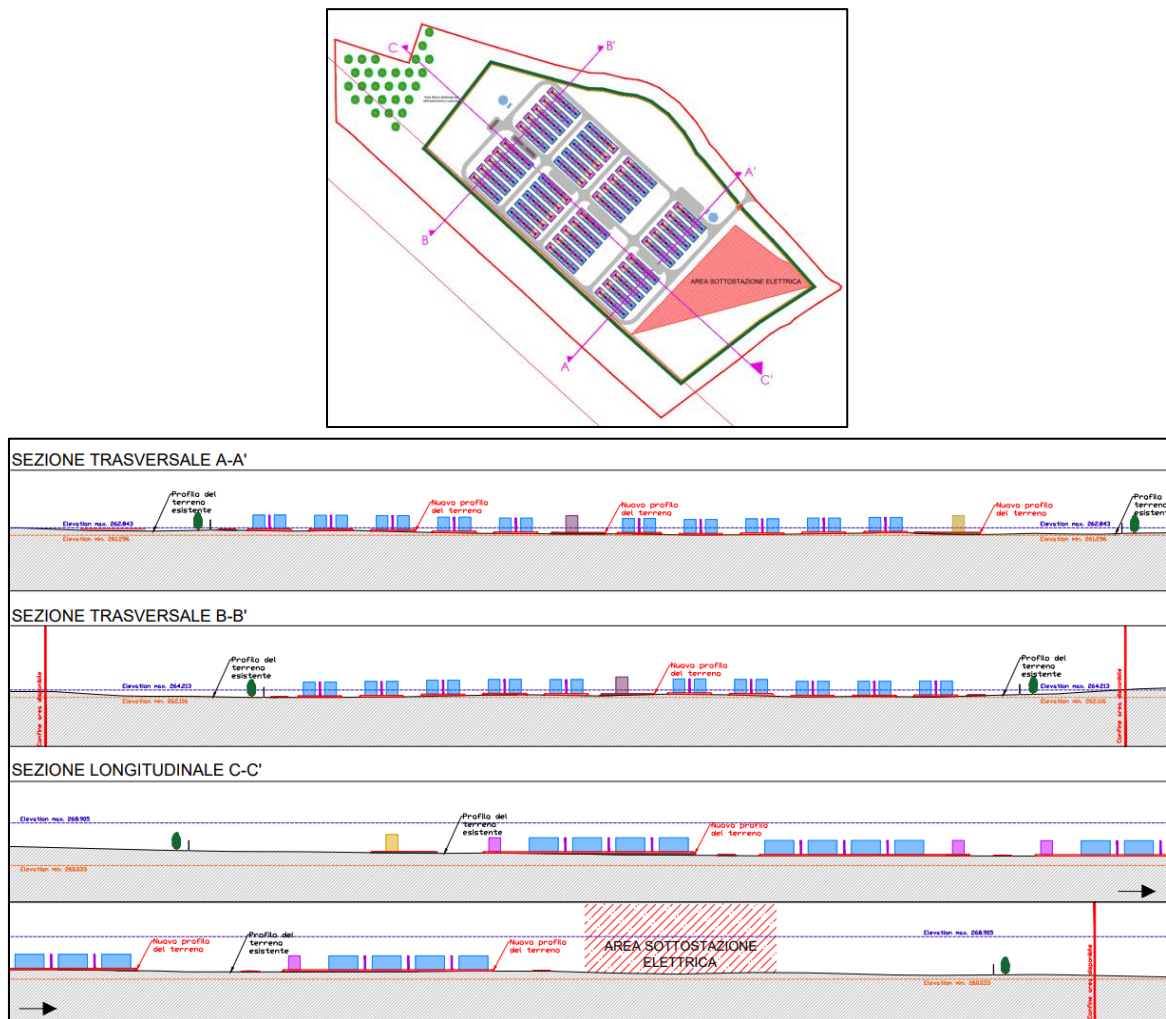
Extract of table "Layout plant: general planimetry_terrain sections"
